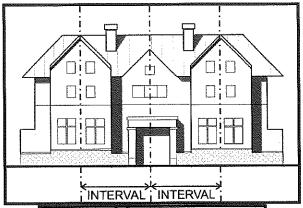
For commercial buildings built up to the sidewalk, provide facade articulation features at no more than 30-foot intervals.
